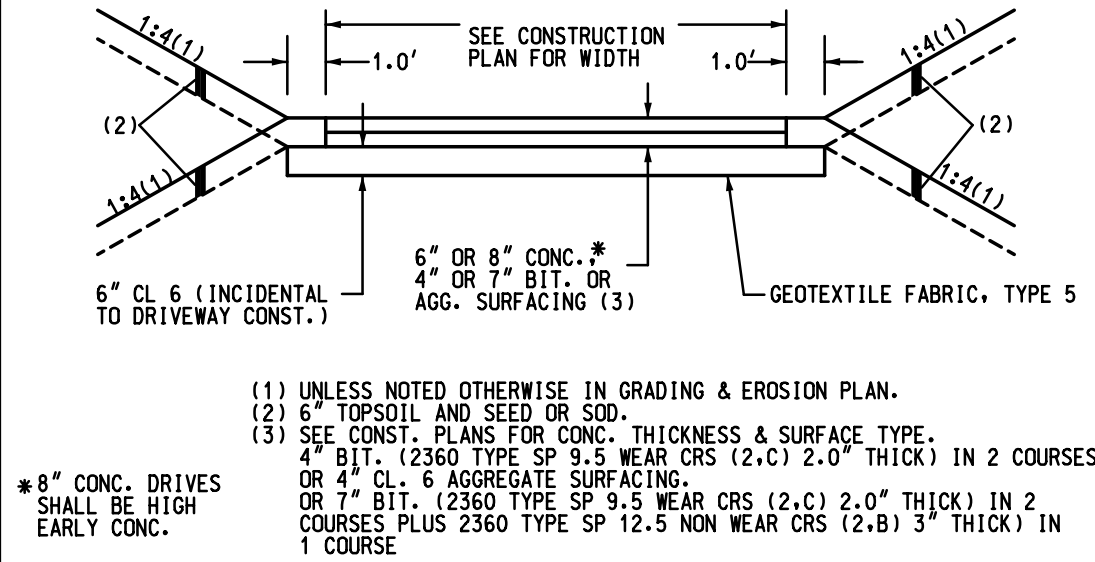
DETAIL OF DEPRESSED WALK AREA AT DRIVEWAYS
